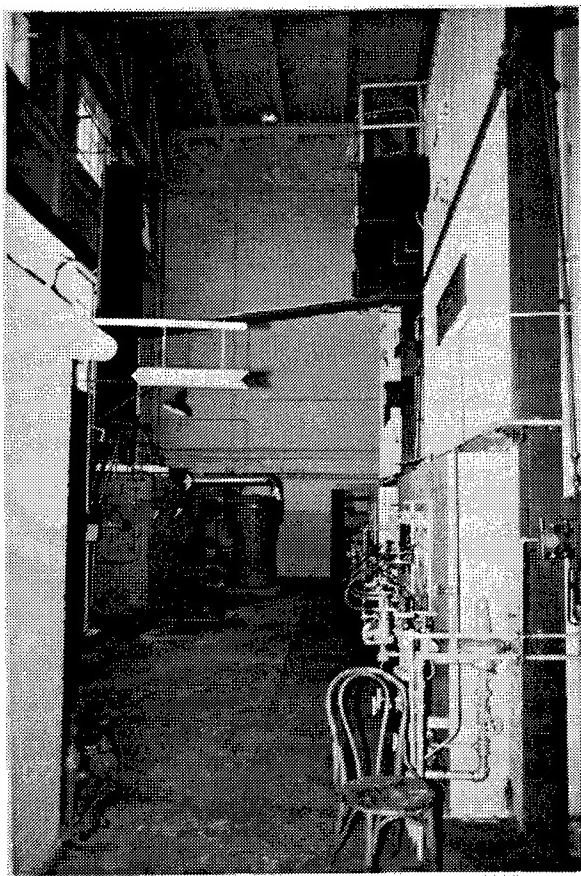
Building CC-1: Interior view of a Boiler House that is located on Load Line #1 which is a Medium Caliber Loading Plant that manufactured 75-mm shells.
